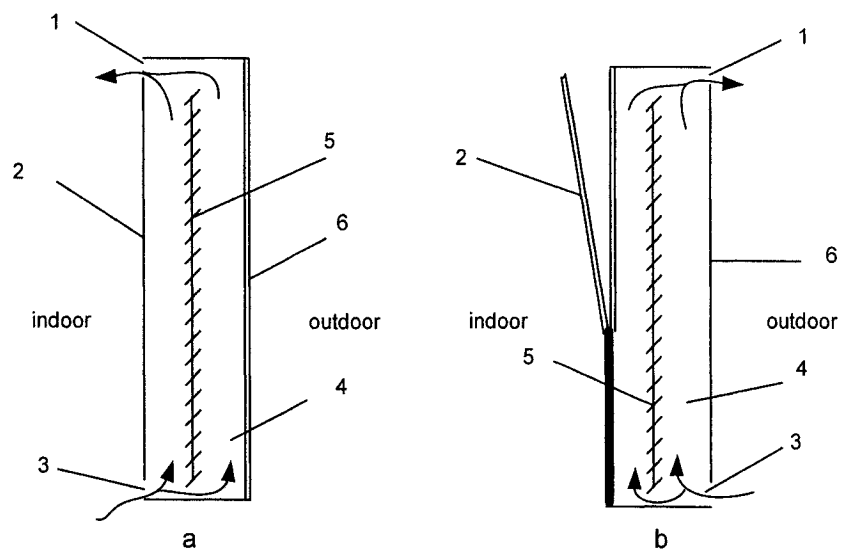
Components of ventilated double-glass façade (a) mechanical ventilation (b) natural ventilation. (1) air outlet, (2) interior pane, (3) air inlet (4) air cavity, (5) shading device and (6) outer pane.
